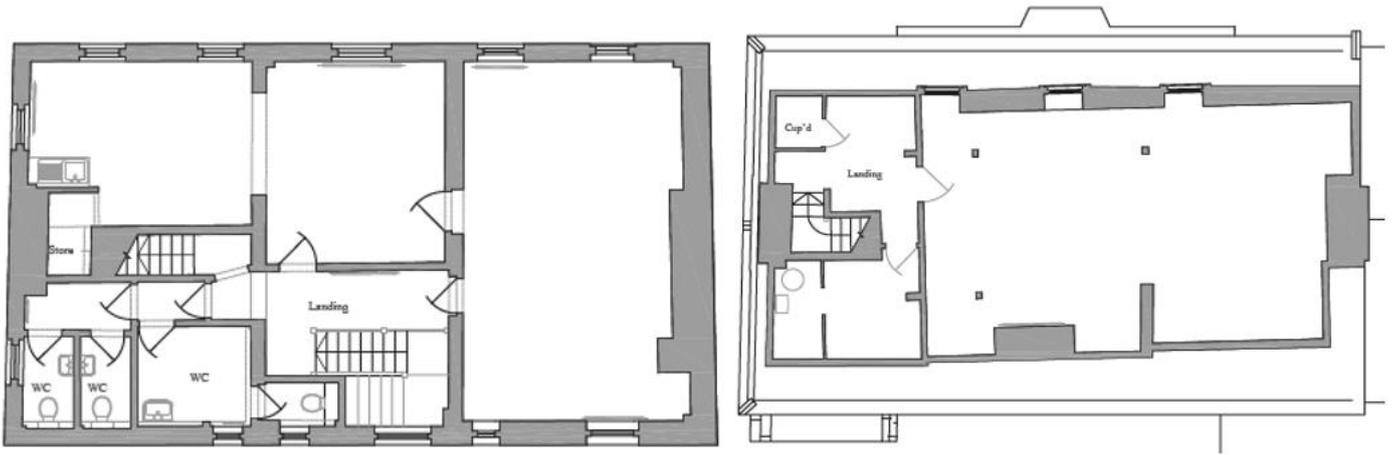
Option 3 - Proposed First and Second Floor (Sui Generis)
